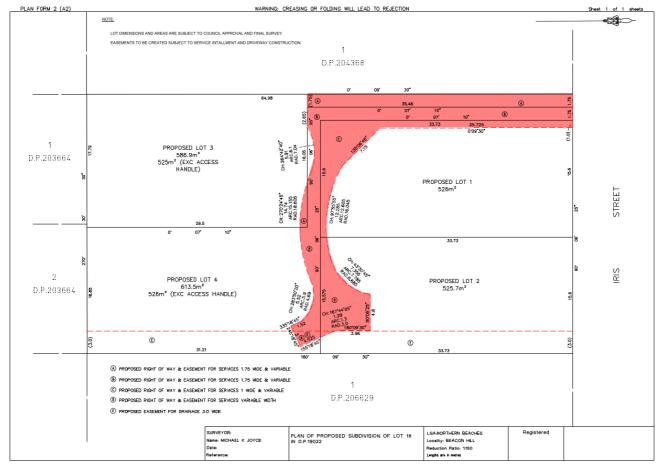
Proposed Subdivision Plan with access driveway excluded from lot size calculation in red.
